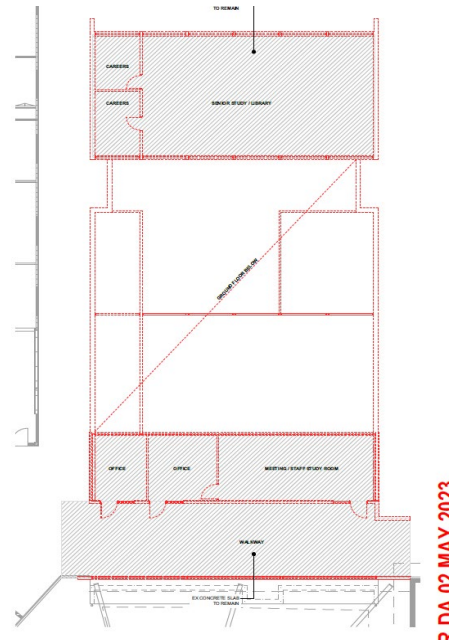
Existing Floor Plans Block D and Staff Room (Ground Floor)
